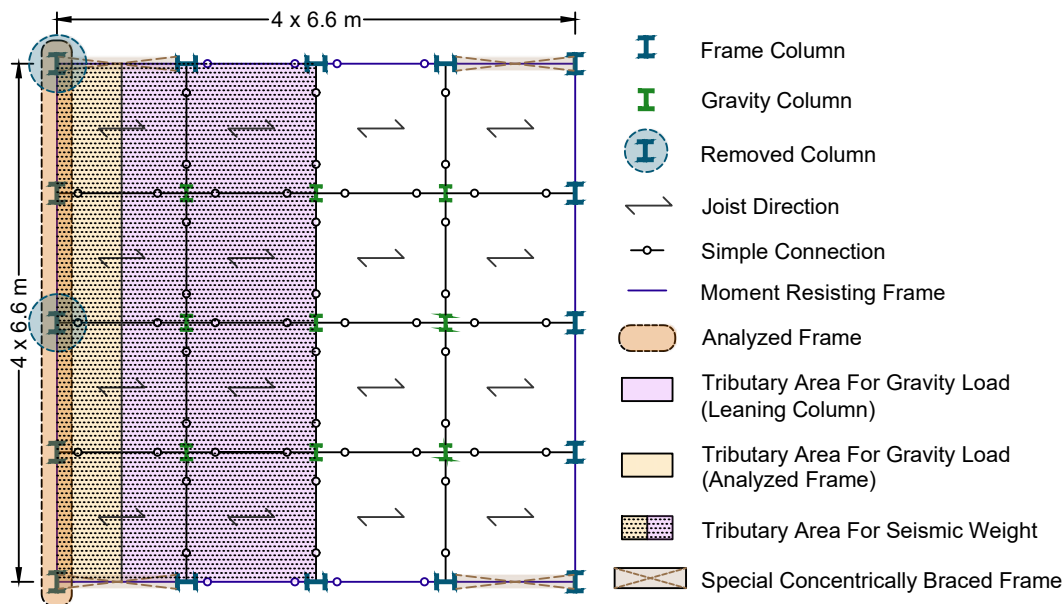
Plan configuration, structural layout, and tributary gravity loading used for the archetype models
